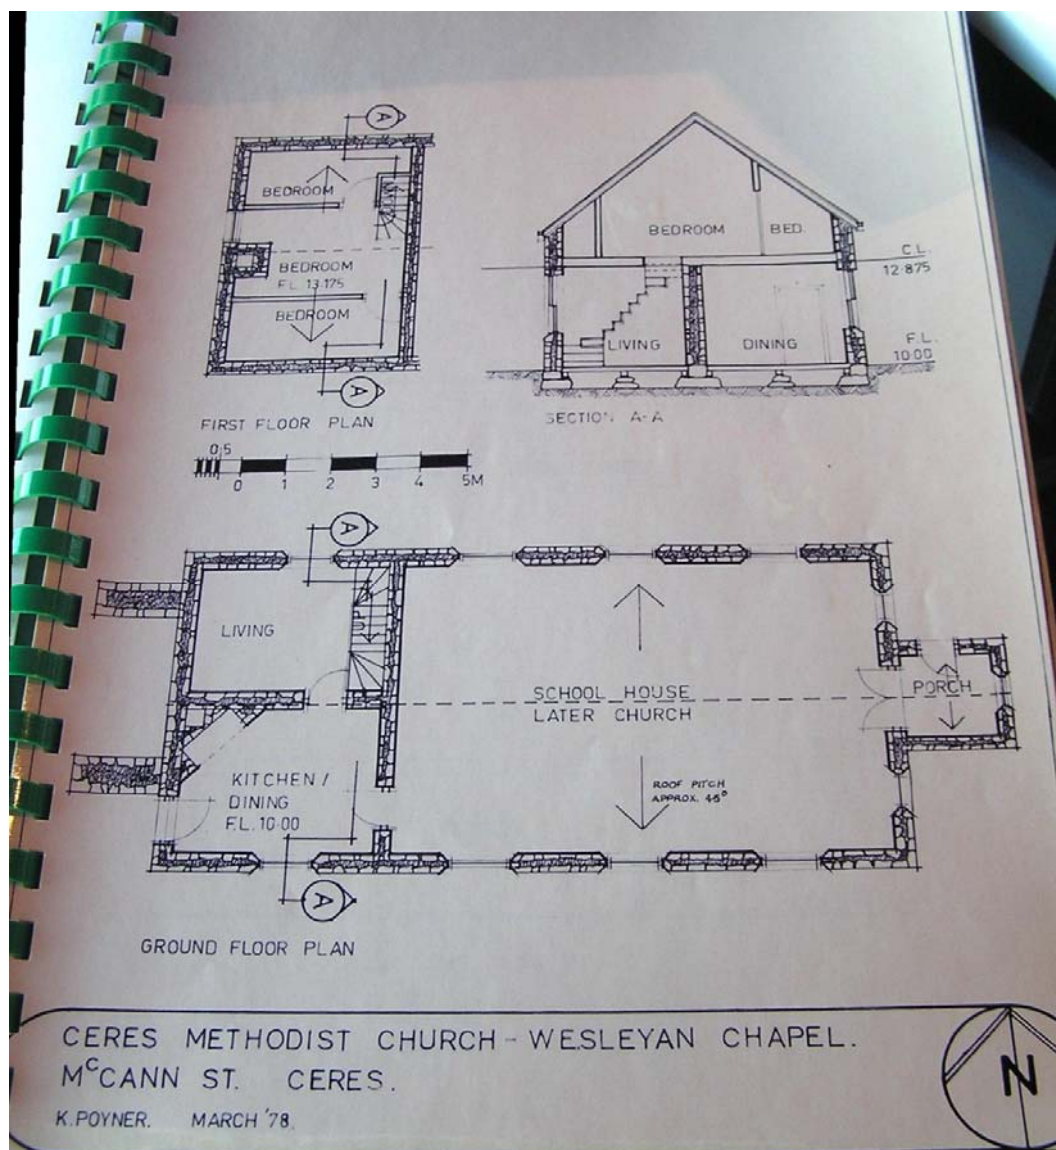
K. Poyner, Ground & Mezzanine Floor Plans & Section Drawing of the Ceres Church.
